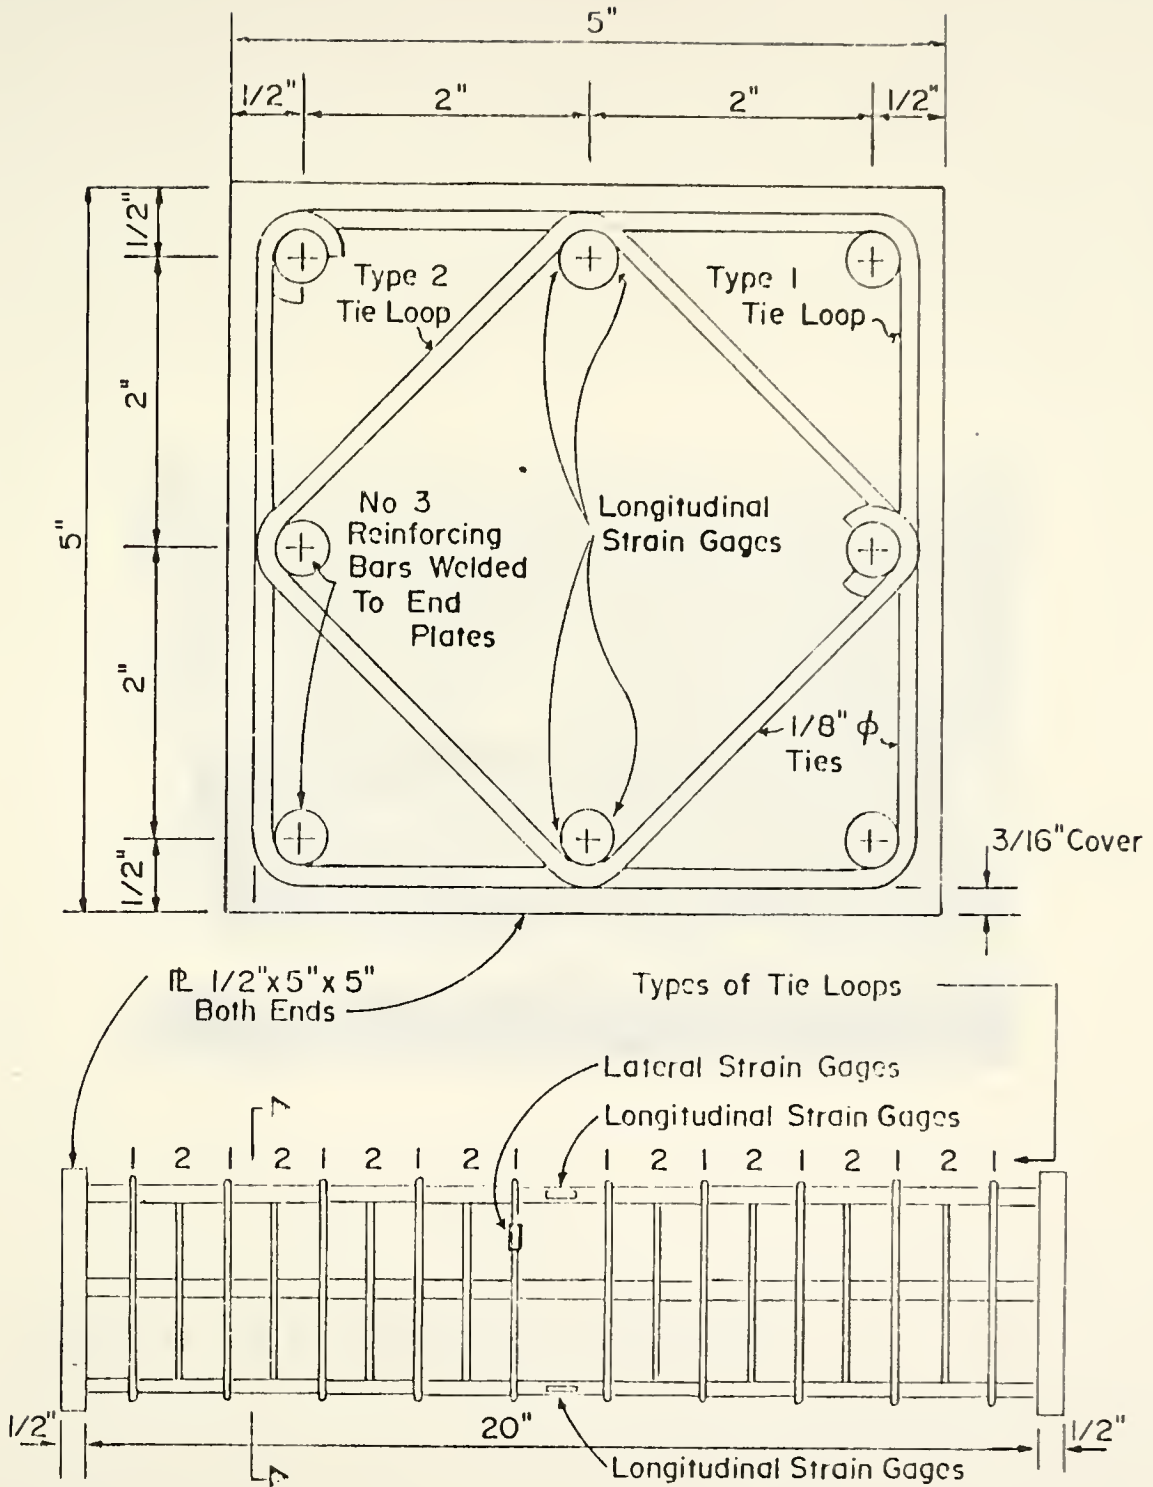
TIED SPECIMEN REINFORCEMENT ARRANGEMENT
